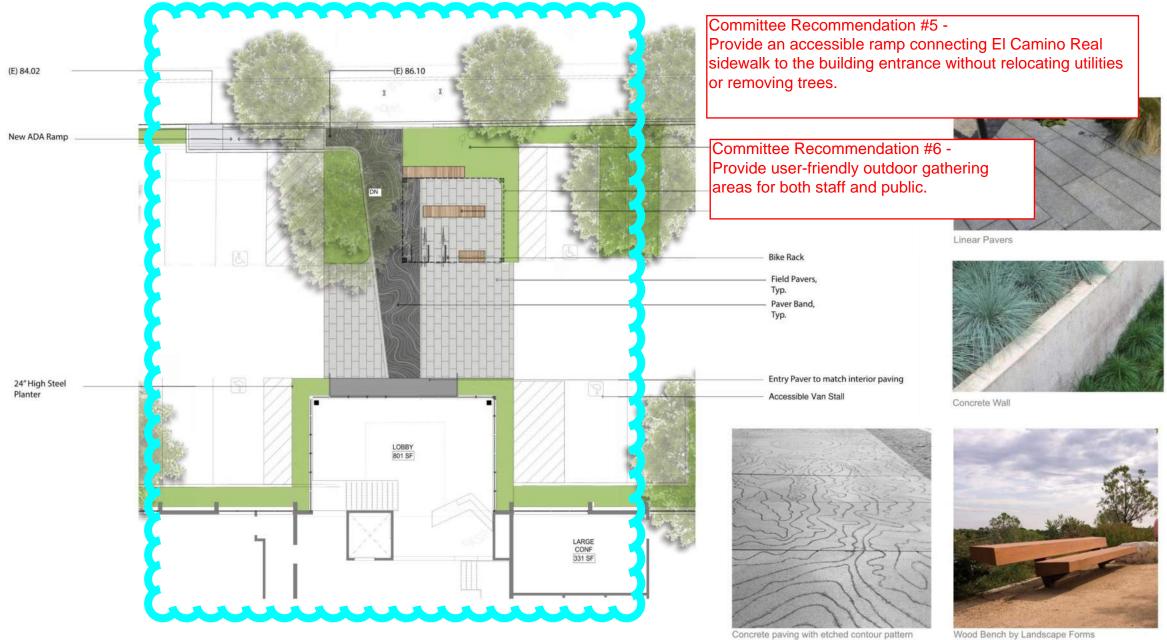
EXHIBIT C - SPACE PLANNING - GARAGE AND FIRST FLOOR
